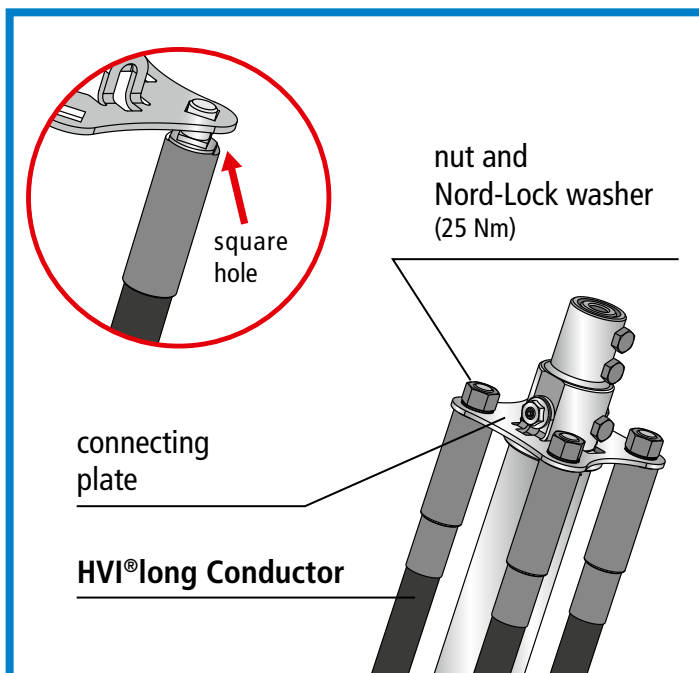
Step 3 for installing a HVI®long Conductor outside the supporting tube
